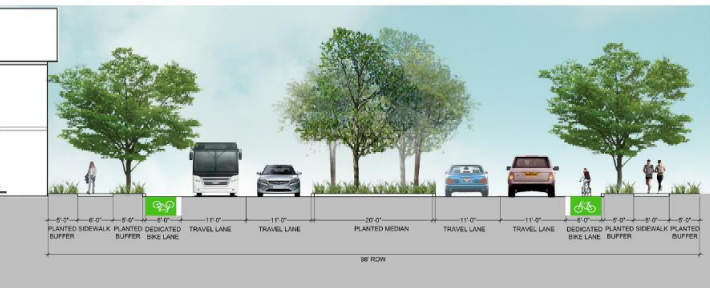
Proposed Collector Conditions With Dedicated Bike Path - Bellfort Street
